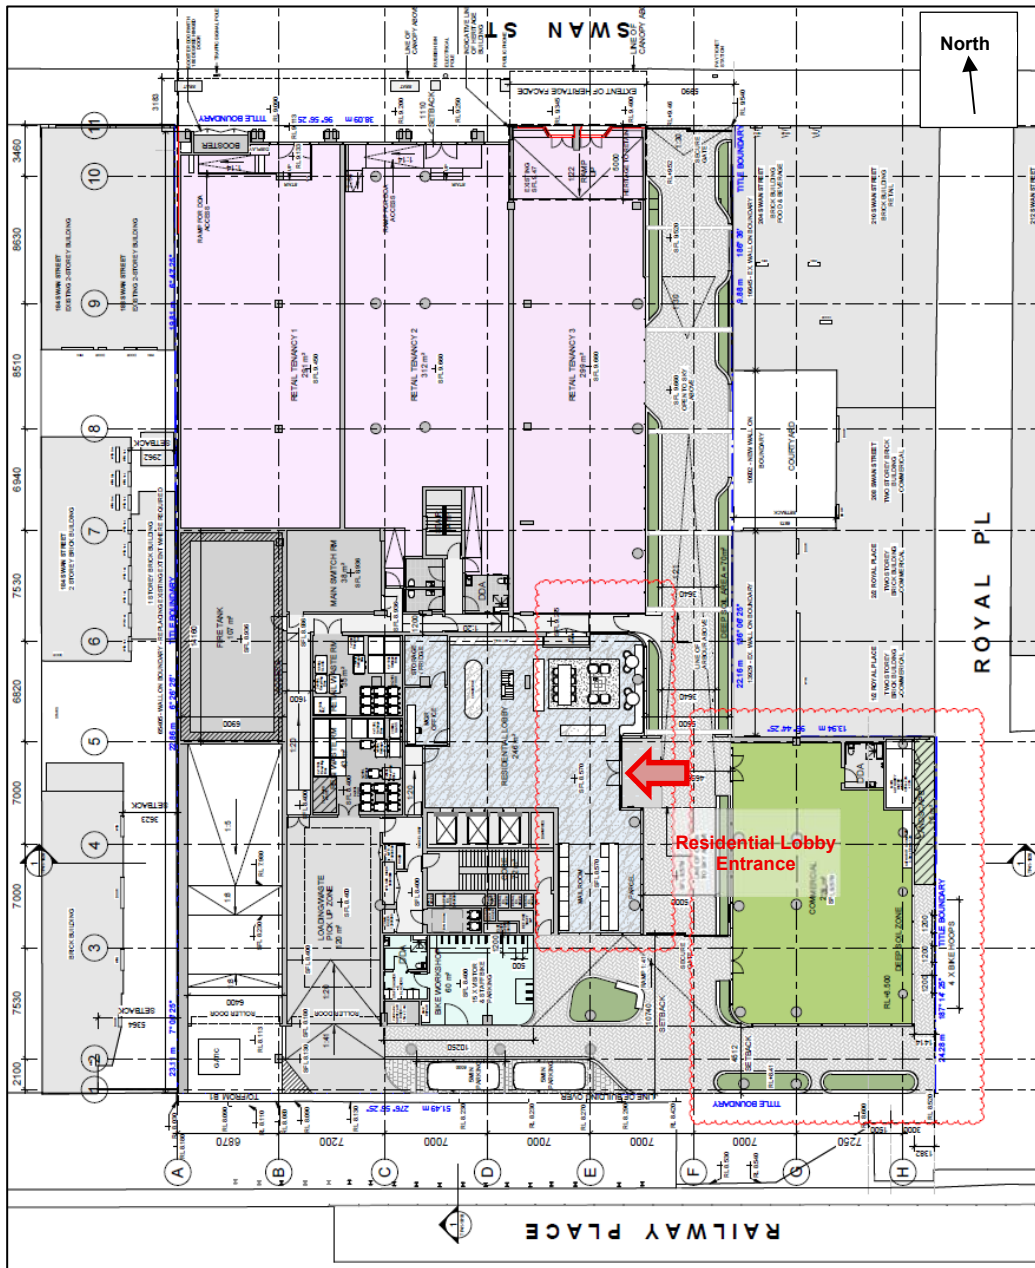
Ground floor plan of the proposed 188-202 Swan Street Development (residential lobby entrance indicated by red arrow).
